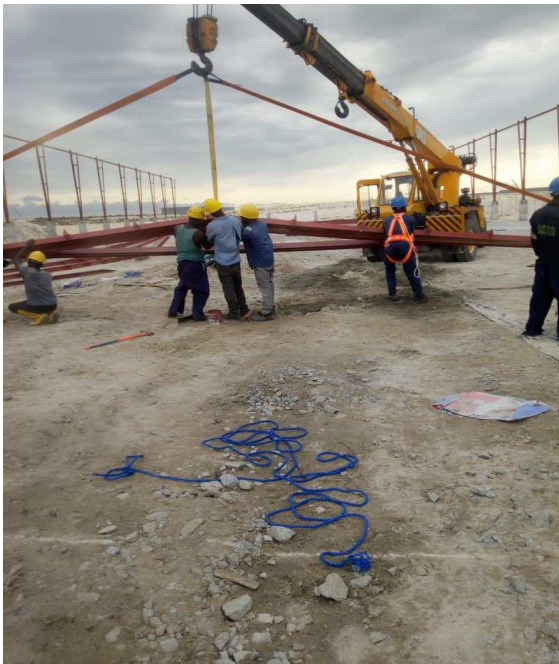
ERECTION PROCESS OF STEEL RAFTER BEAM
